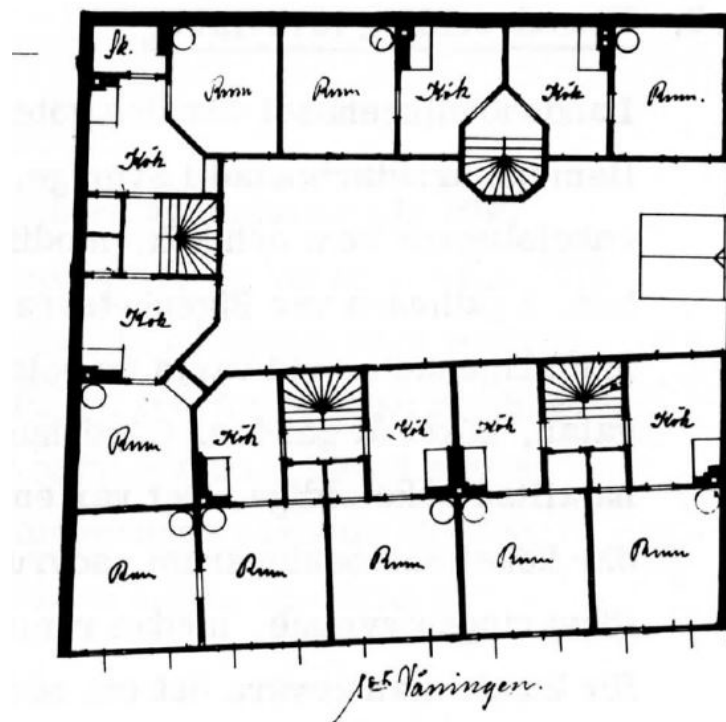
1891. One room apartments and one apartment with two rooms. Toilets are still placed in the courtyard (Larsson & Lönnroth 1972)
